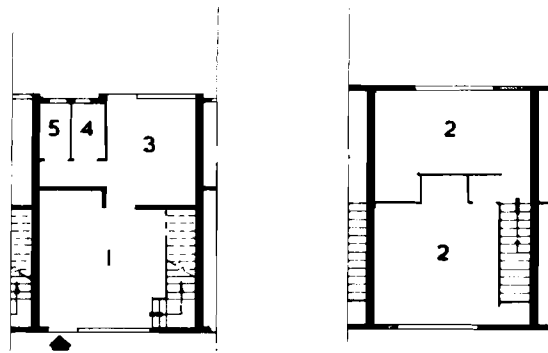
Singapore Improvement Trust (1957). Two storey “terrace” house, Duchess Estate. Floor area 57 m². 1 living room, 2 bedrooms, 3 kitchen, 4 and 5 men’s and women’s conveniences.
